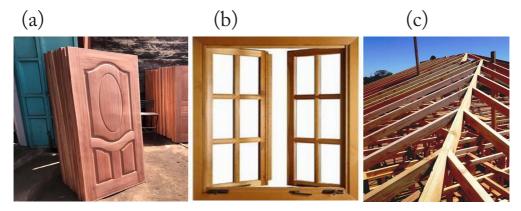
Wood work products (a) door, (b) window and (c) roof
